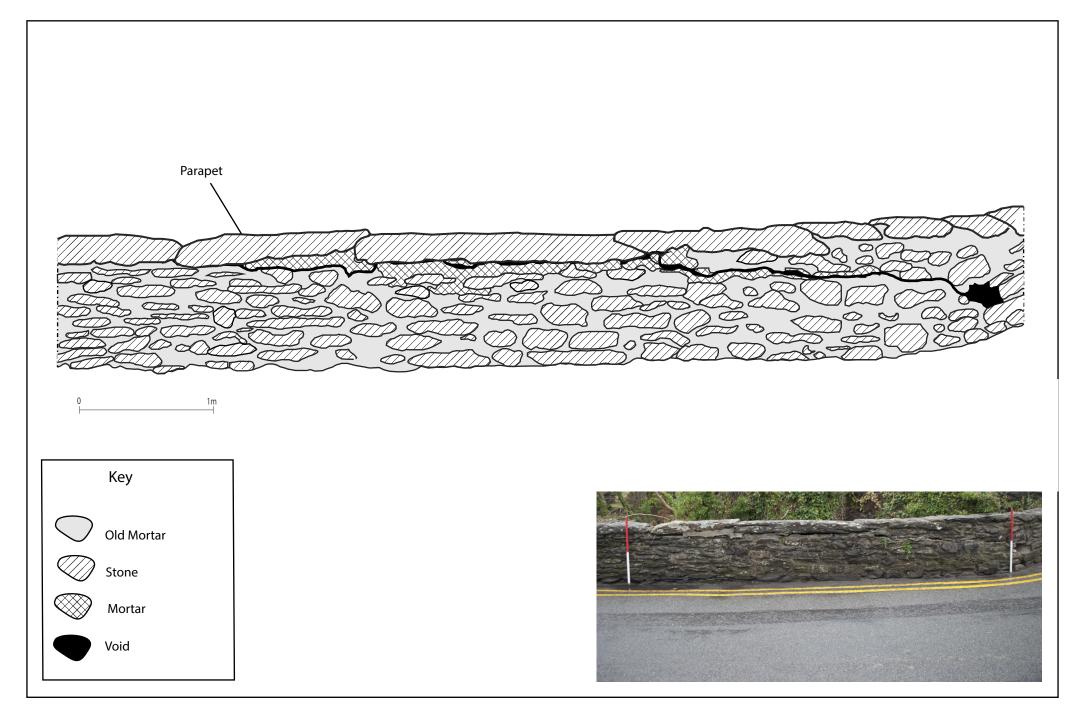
Southeast facing elevation of Pont-y-Pair Bridge detailing damage and existing repair. Scale as shown
